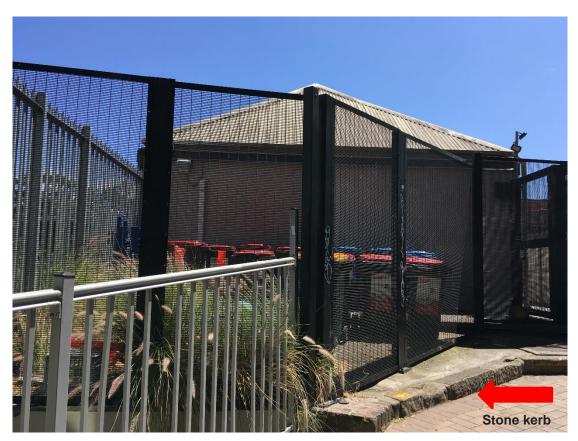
King Street/Goodsell Street station entrance showing modern rubbish bin cage and original stone kerb (RPS 2020)
